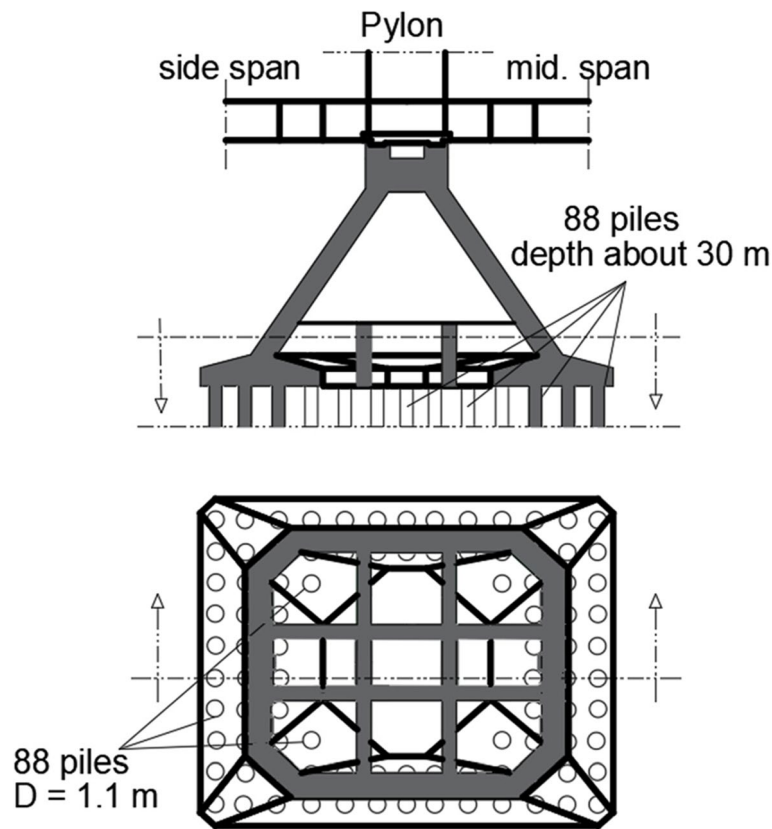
General layout of piers on axis 7 and 8 and the pile arrangement
